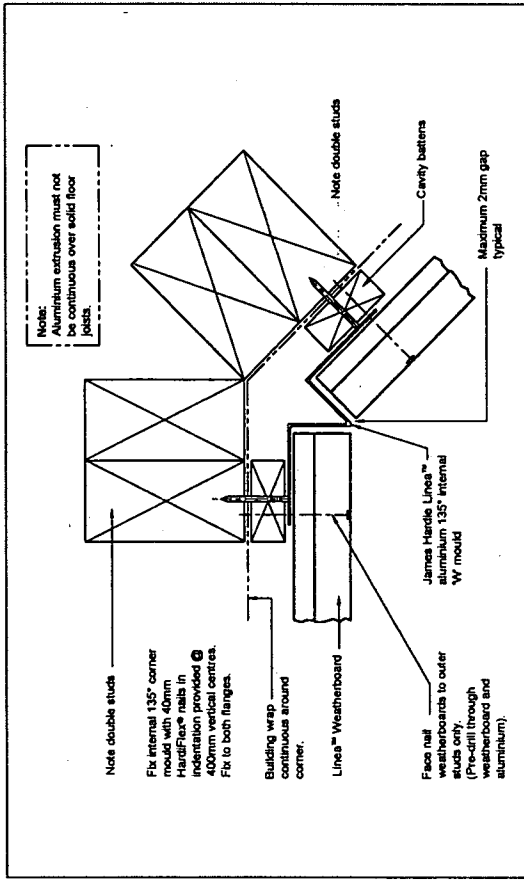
CAVITY INTERNAL 135° ALUMINIUM 'W' MOULD CORNER
